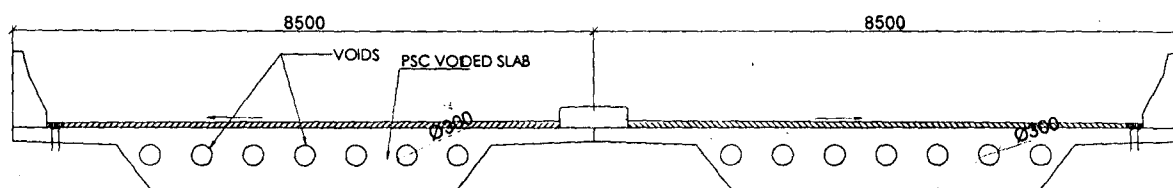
Typical cross section with PSC Voids slab for 4-lane deck
